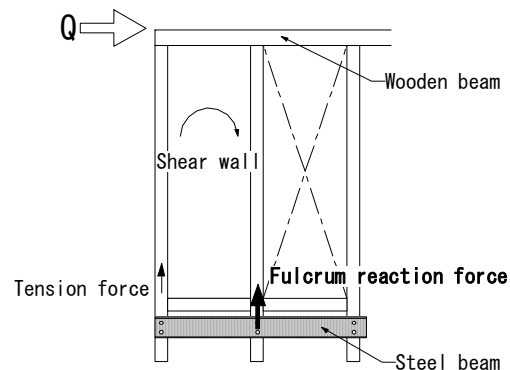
Pull out of pillar leg, Fig.17-Installation of steel beam
